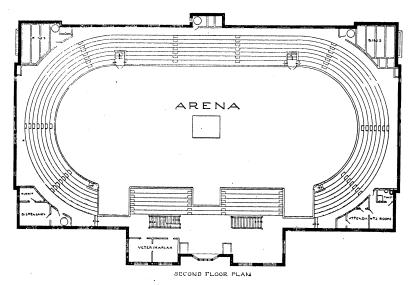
Second floor plan of live stock pavilion, showing arena with concrete ledges for seats and additional offices.
